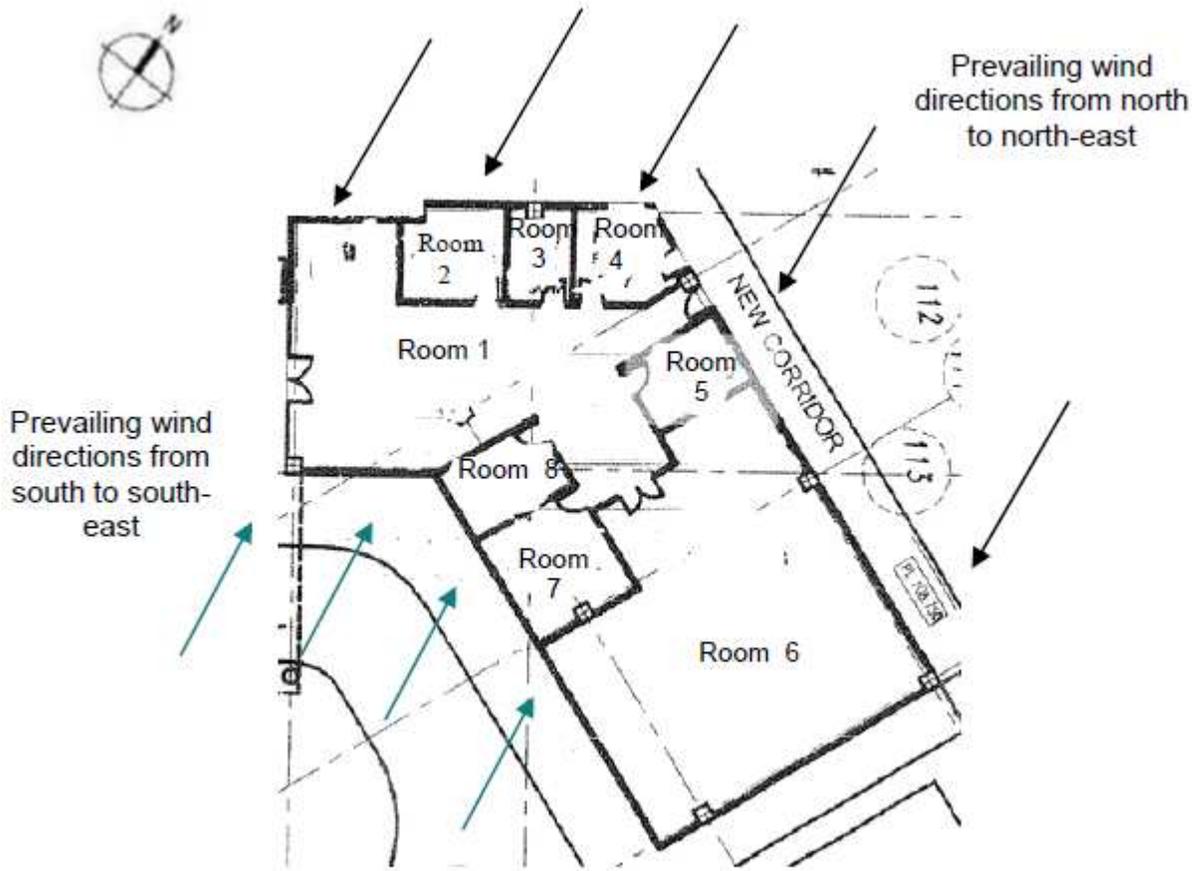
Building layout shows not all rooms with window openings facing the north and south directions.
